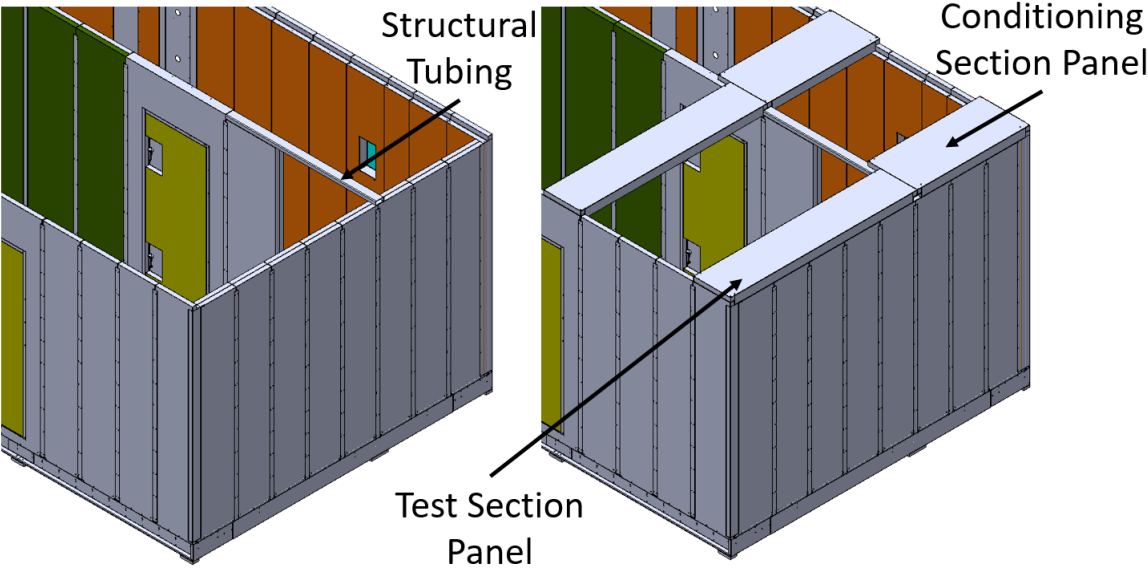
Left: Placement of structural tubing for roof panel support. Right: Example of roof panel placement in isometric view.
